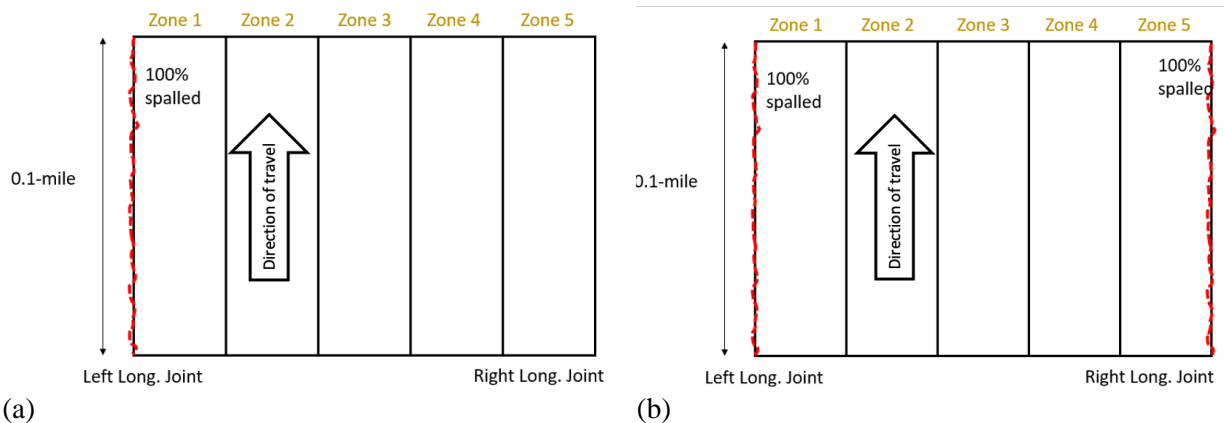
Longitudinal joint spalling scenarios (a) 50% spalled and (b) 100% spalled for a 0.1-mile interval segment
